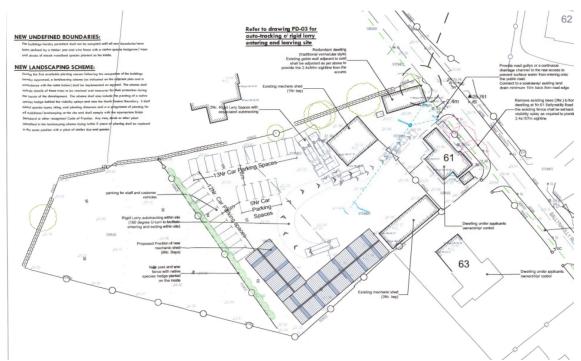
the development which was approved, which should provide bounding to the east of the site however not all of what was approved was evident on site yet. See Photo 1 below.
